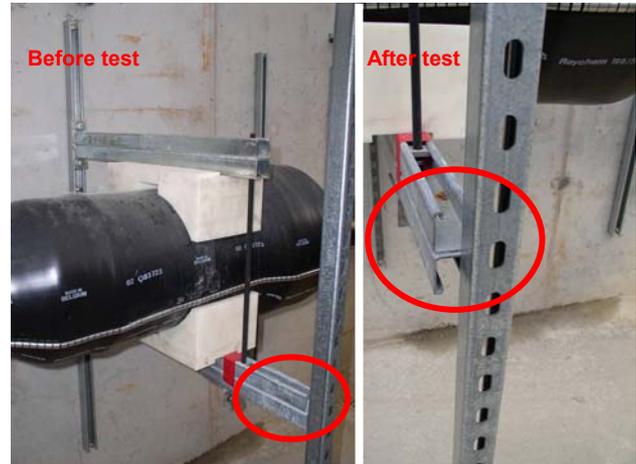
Movement of the horizontal joint support under the effect of an asymmetric load. (Horizontal joint support and vertical beam not connected)
